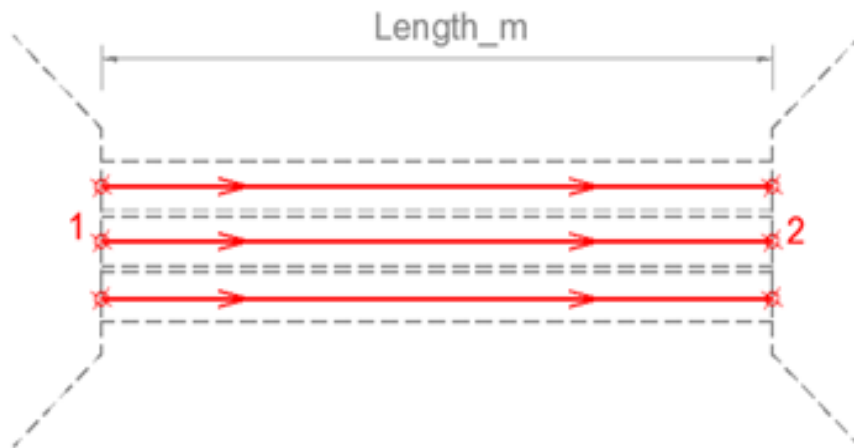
Stormwater Pipe - Multiple cell pipe/culvert arrangement
